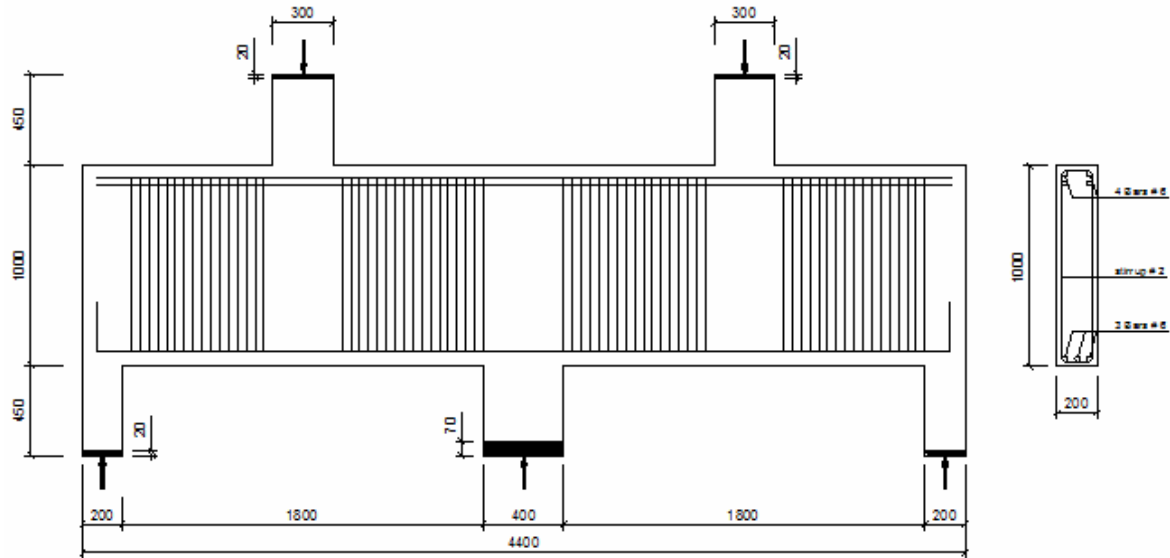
Details of continuous deep beam (Rogowsky, et al.)
